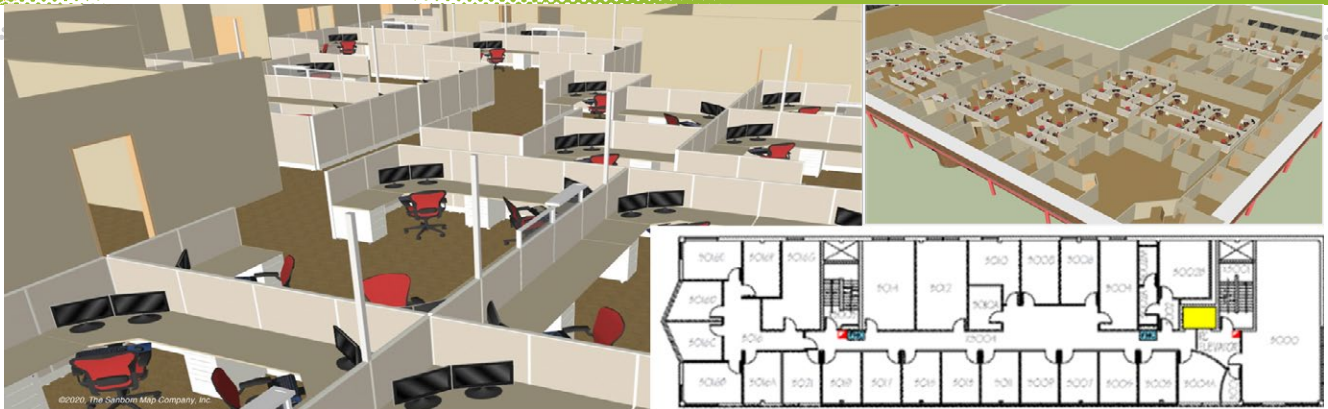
Views of an LoD4 building model of an office building showing interior detail of cubes, furniture etc. The floorplan is shown for reference.
